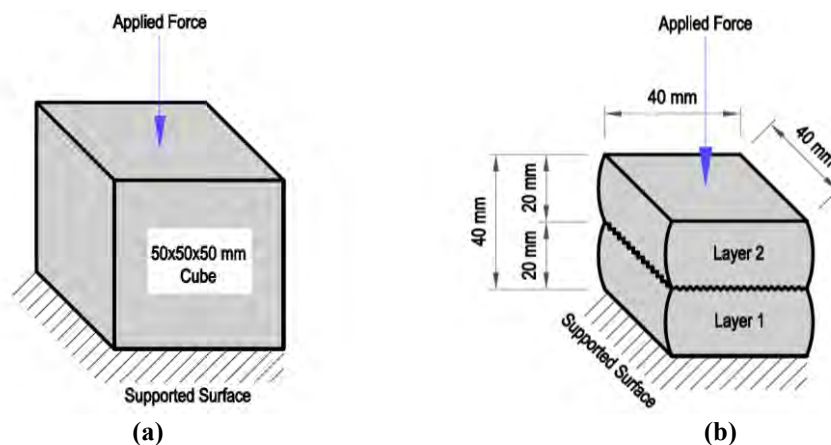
Specimens for Compressive Strength (a) Molded and (b) Printed.
